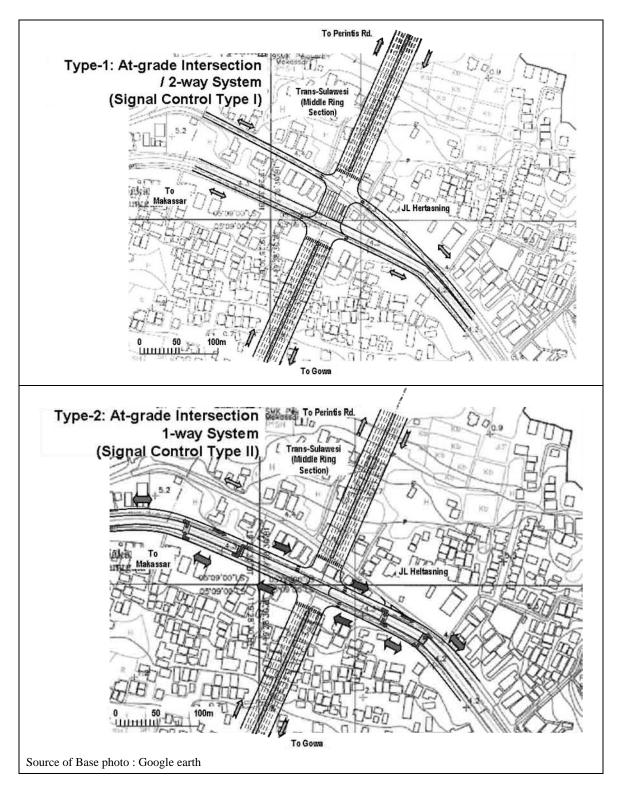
(2) Alternative Intersection Plans for TS-4 IC
